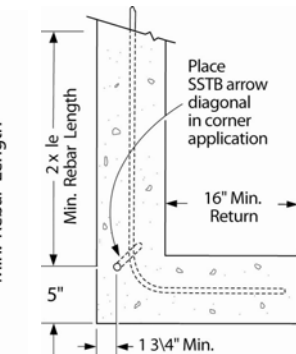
SSTB ANCHOR BOLT INSTALLATION—CORNER OF STEM WALL (Min. 16\"/>
